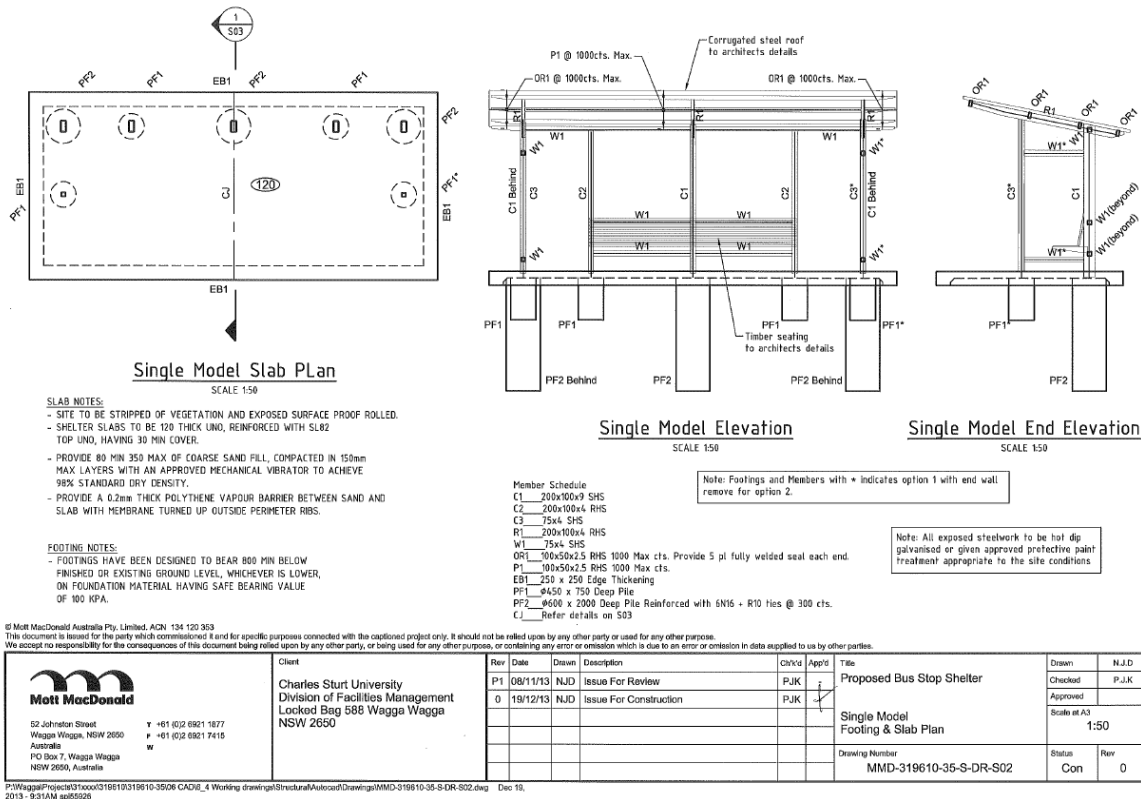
Bus Shelter Single Model Footing and Slab Plan
